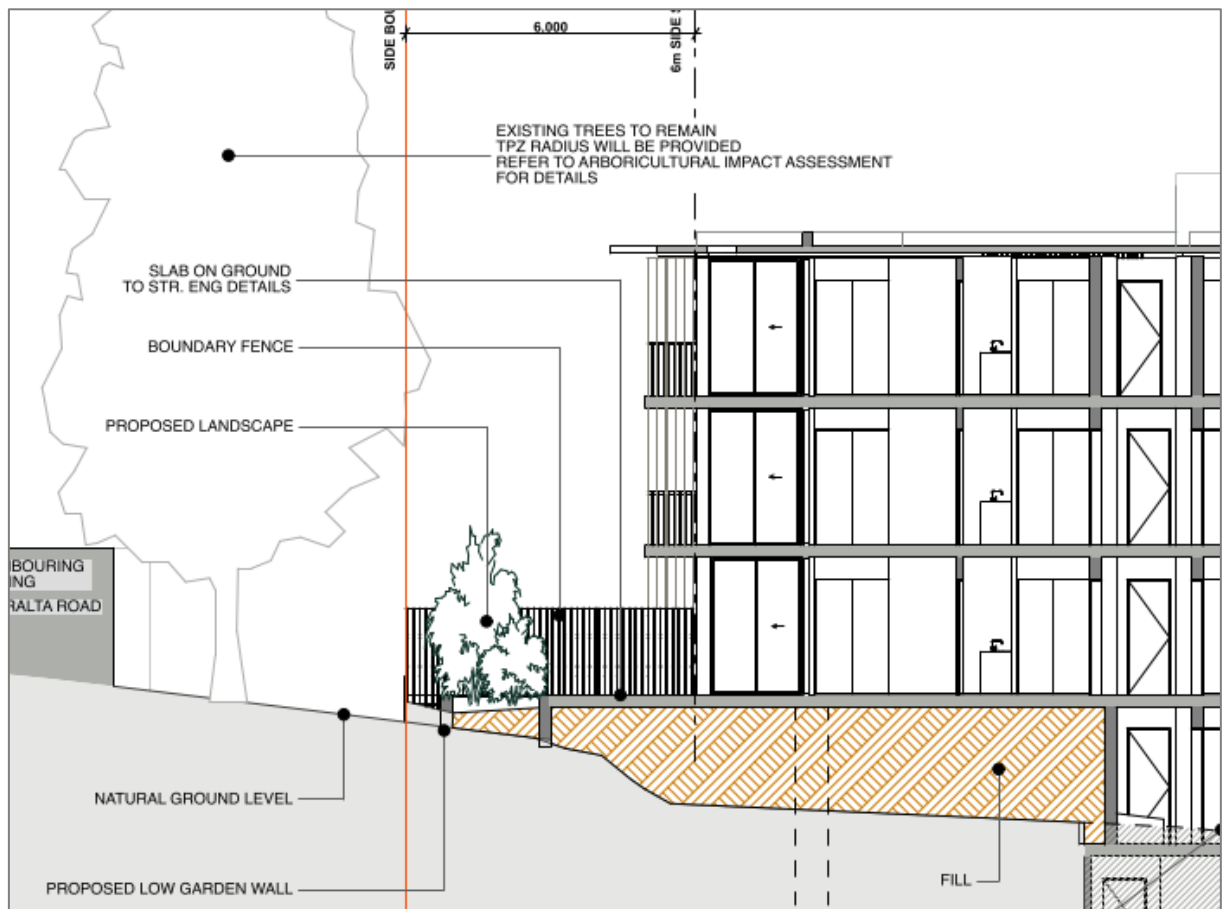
Eastern boundary detail – Building D interface with 93 Karalta Road
